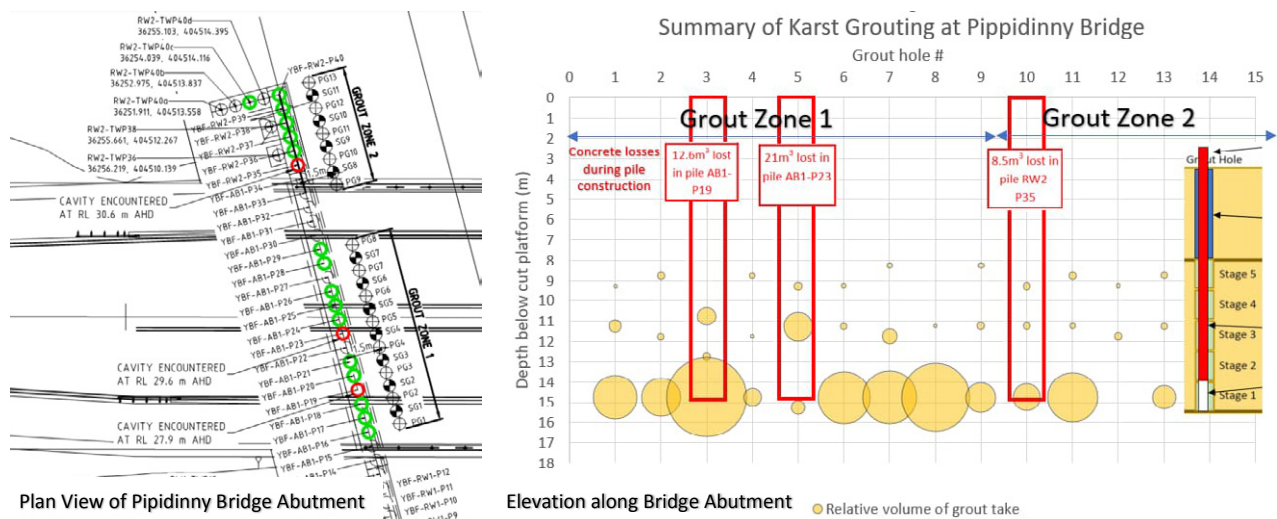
Plan (left) and elevation (right) of grouting operations at Pipidinnny Road Bridge
